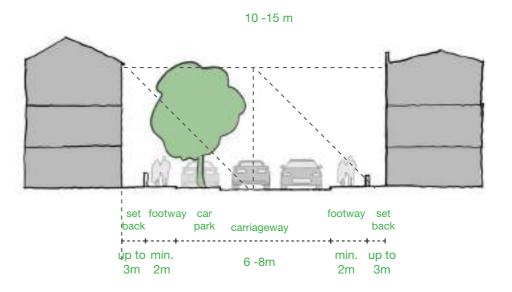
Typical street section of urban street with traffic in Lichfield City Centre area
